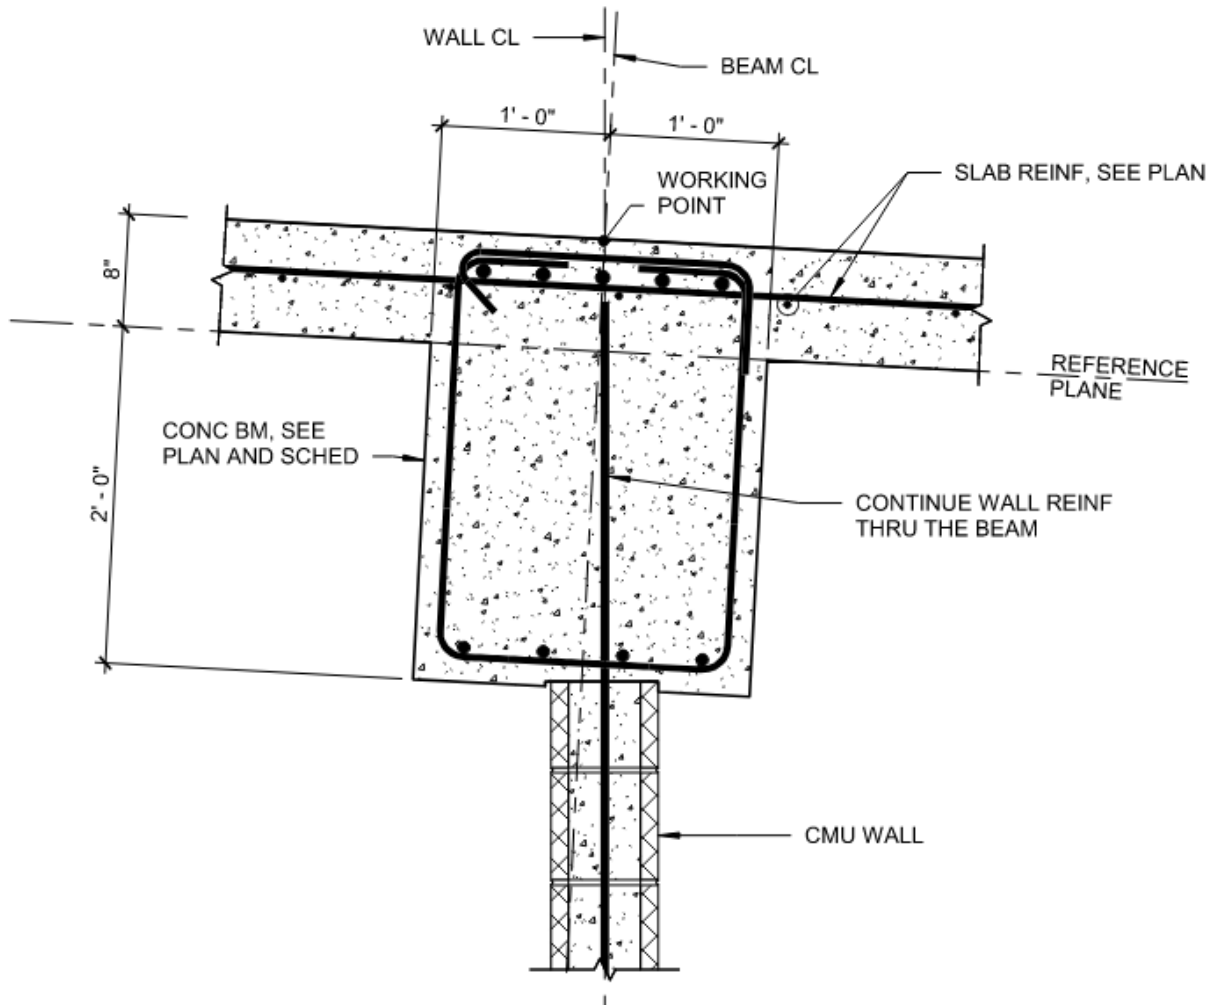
Detail 3 from Sheet HQ-S4-3-04, dated November 15, 2023 showing connection between top of CMU wall and reinforced concrete beam overhead in Area E. Note that the vertical wall reinforcement is well-anchored above the CMU wall to permit shear forces from the diaphragm to be transferred into the wall through shear friction
